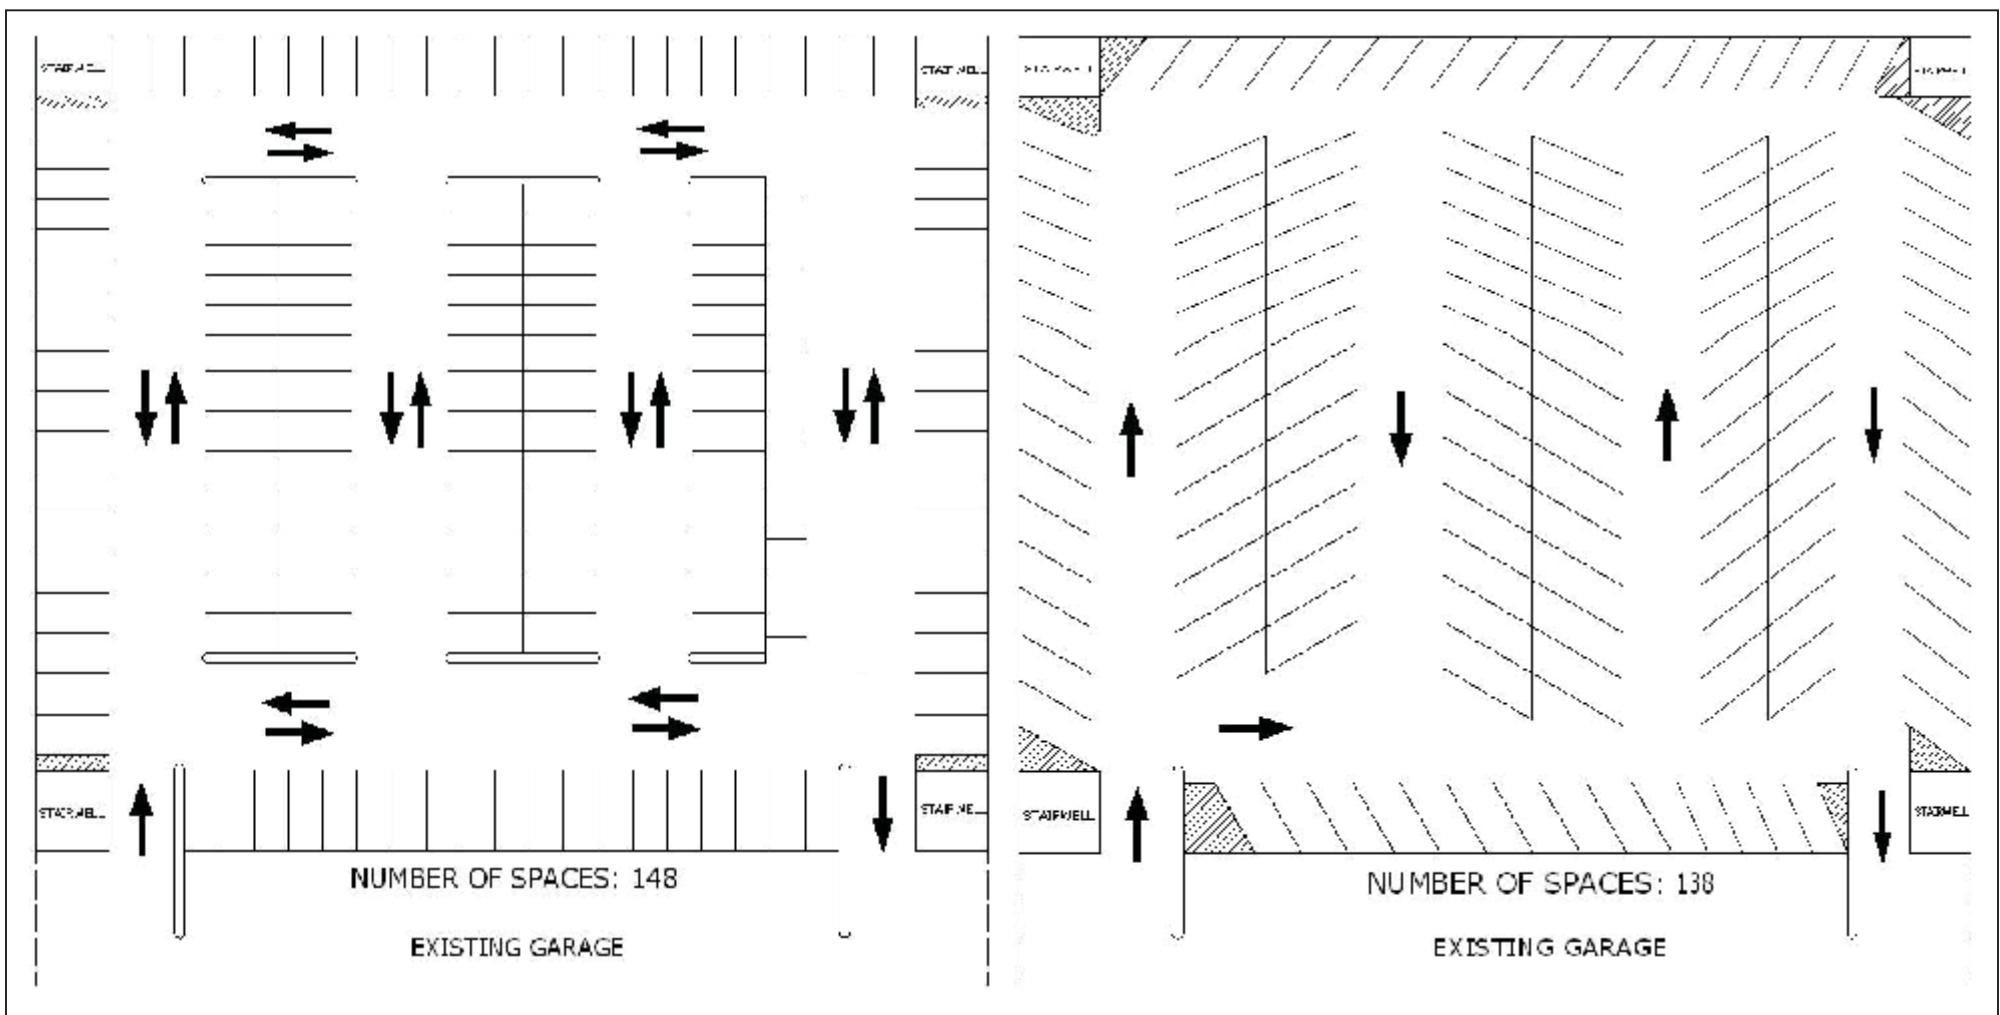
Proposed Site 3 Parking Garage Designs
